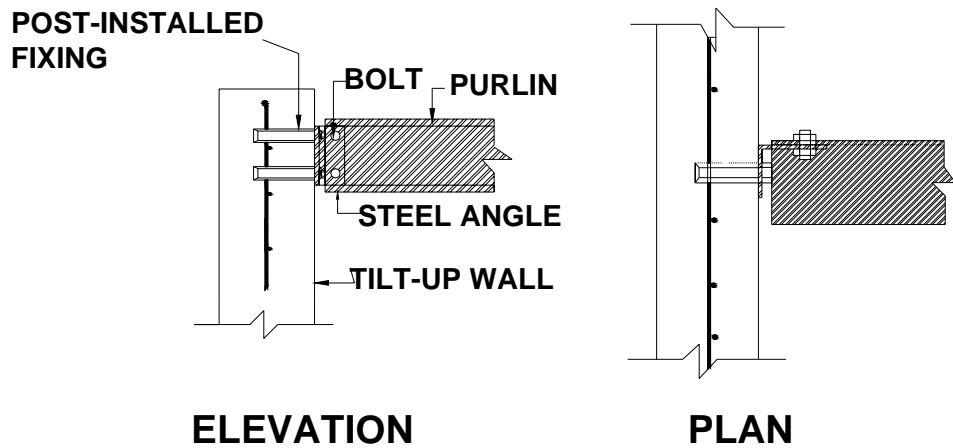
The detail connection between precast wall and roof steel trusses (Restrepo et al.,1996).
